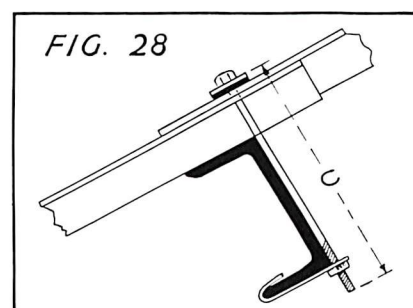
$\frac{1}{4}$ " Galvanised Long Bolts and Toe Clips for fixing to channel iron purlins.
